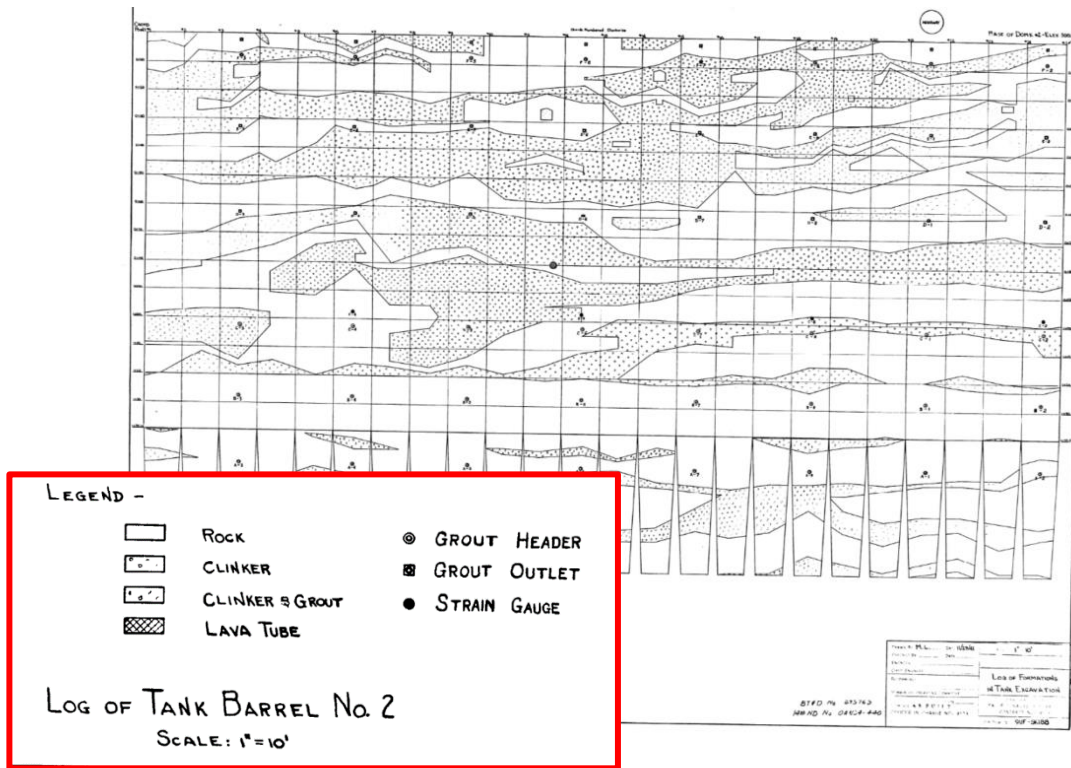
As-Built Drawing, Underground Fuel Storage, Log of Formations in Tank Excavation – Tank 2
